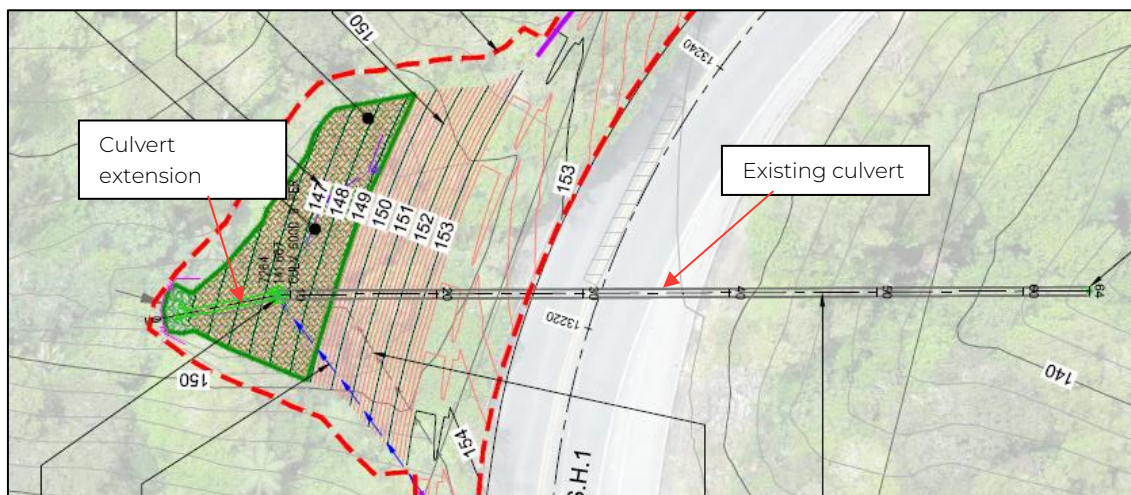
Site H existing culvert shown in black and culvert and manhole in green. New drainage blanket and fill shown in green and red, respectively.
